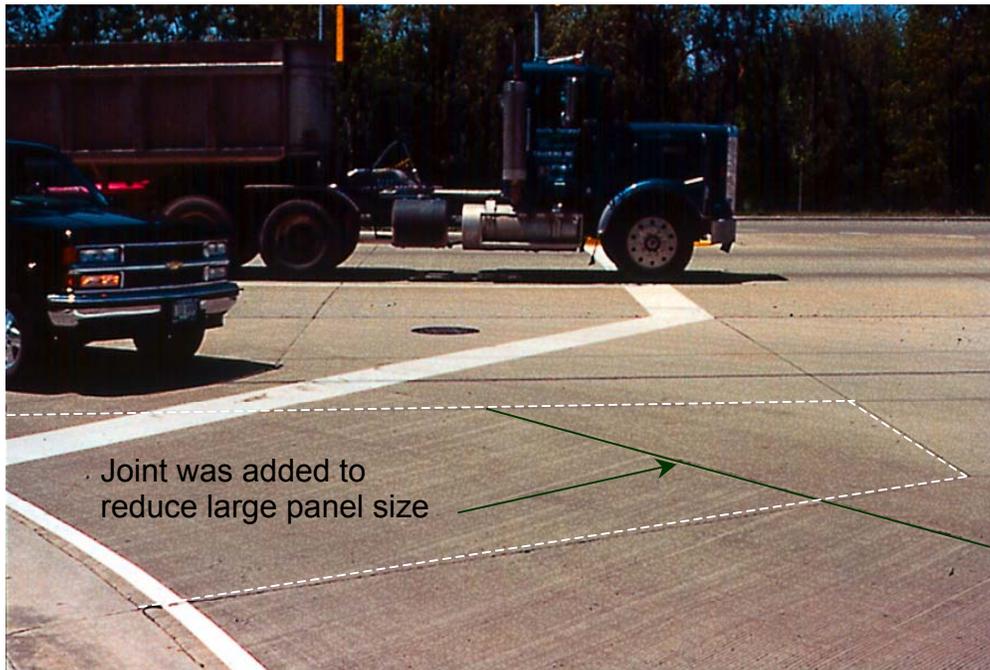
Irregularly shaped slab that has been jointed to reduce crack potential (Photo courtesy of American Concrete Paving Association).
